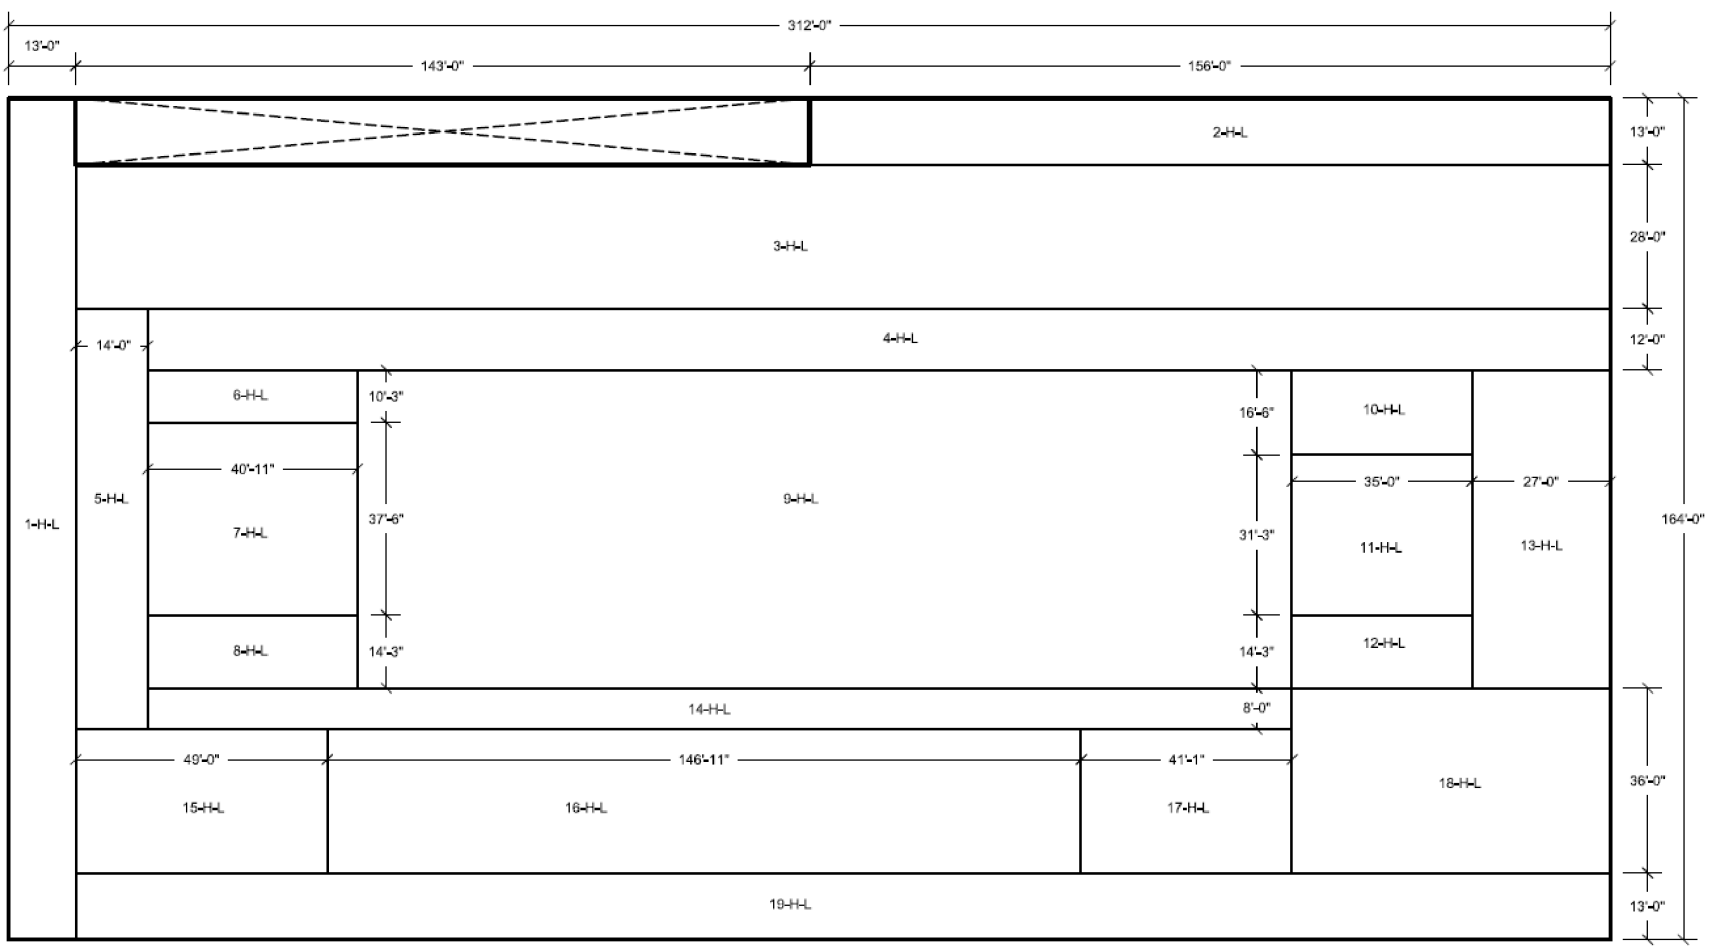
H.6-131 UHS Basin Foundation Mat East/West Reinforcement Zones Top Face
